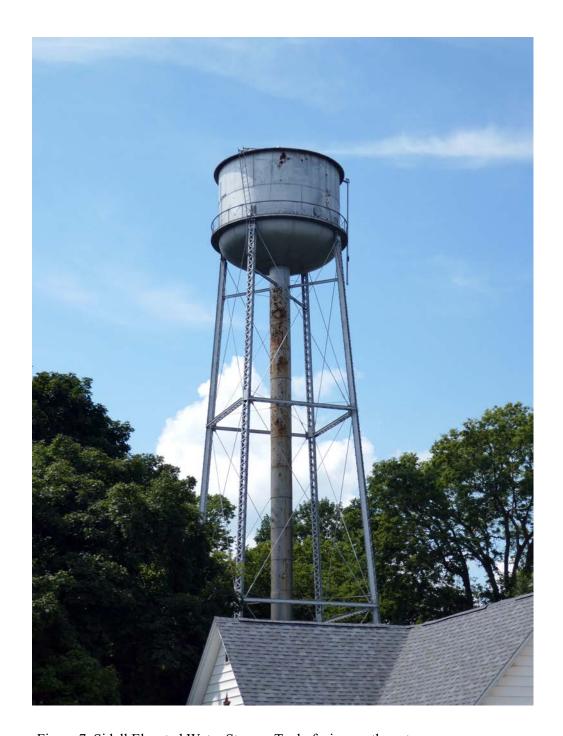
Sidell Elevated Water Storage Tank, facing northwest.
